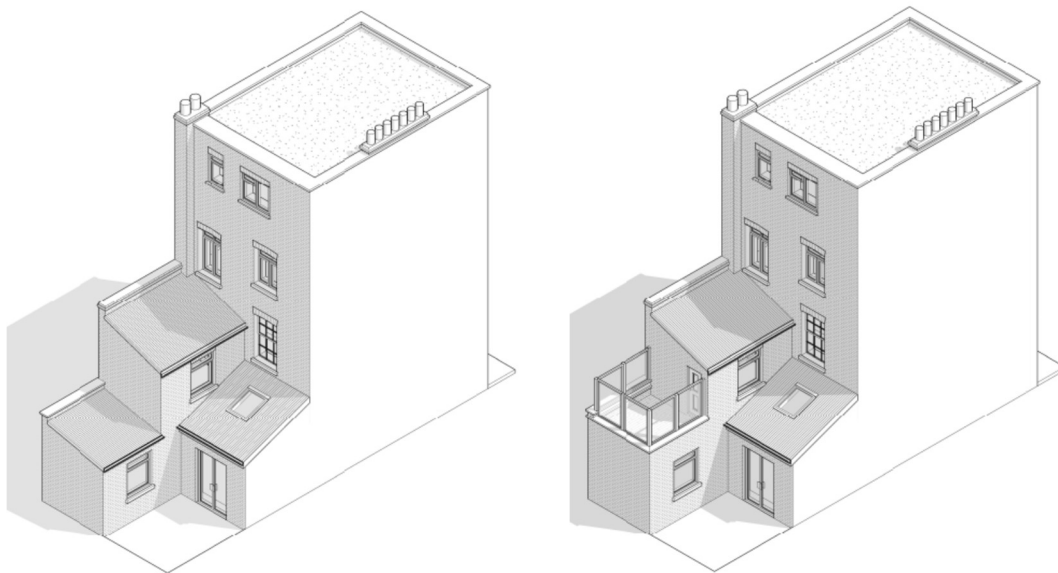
Isometric View showing the existing (left) rear elevation and proposed (right) rear elevation showing the proposed roof terrace.
